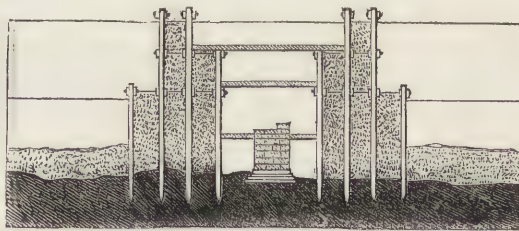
TRANSVERSE SECTION OF COFFER-DAM.
